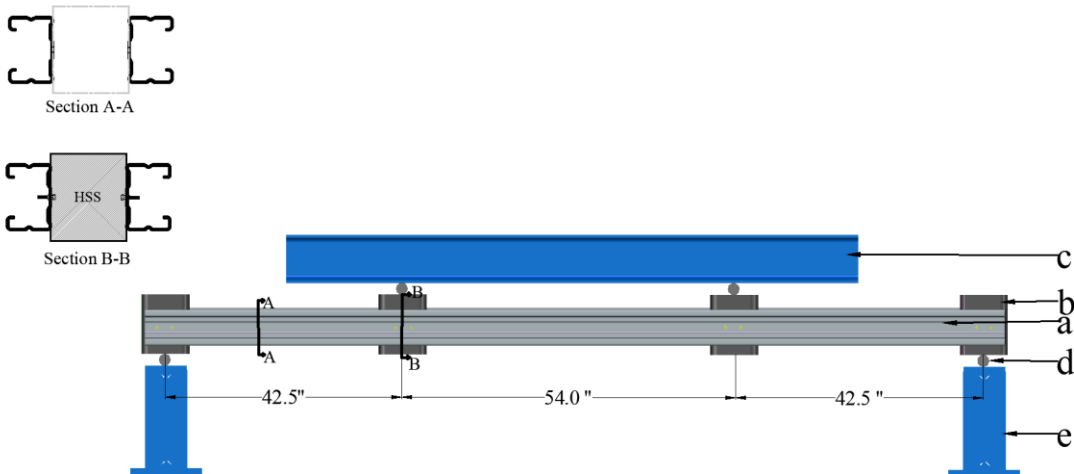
Elevation view of major axis bending test schematic: a. specimens, b. $7 \times 7 \times 1/2$ HSS sections, c. spreader beam, d. rollers, e. end beam support
